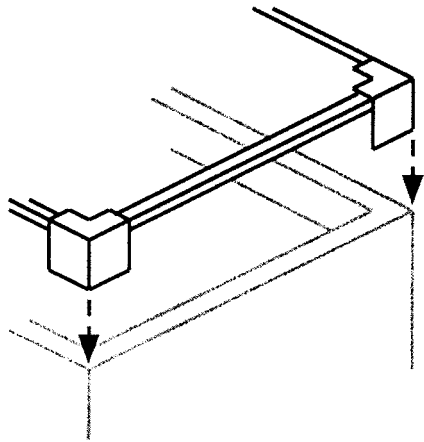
An example of parapet wall sheet metal caps used with L-shape cross-sectioned conductors to protect the building fabric from being struck by lightning.
